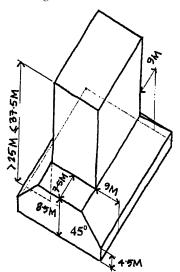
D Building Envelope for Multi-Residential >25m high <37.5m with <150m² Non Residential Component
